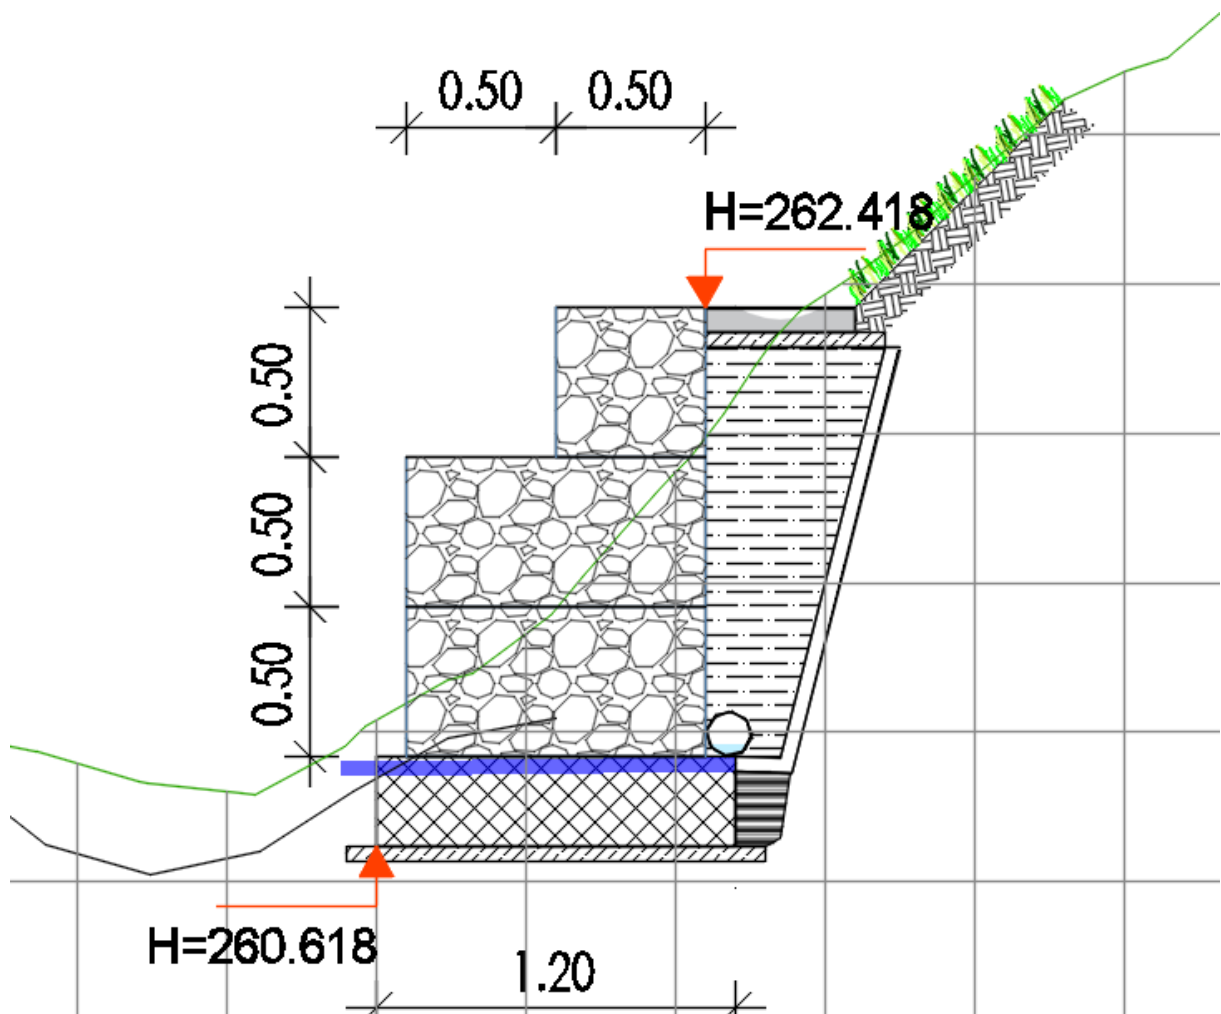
TRANSVERSAL PROFILE OF THE RETAINING WALL STRUCTURE NEAR THE BOREHOLE P6
